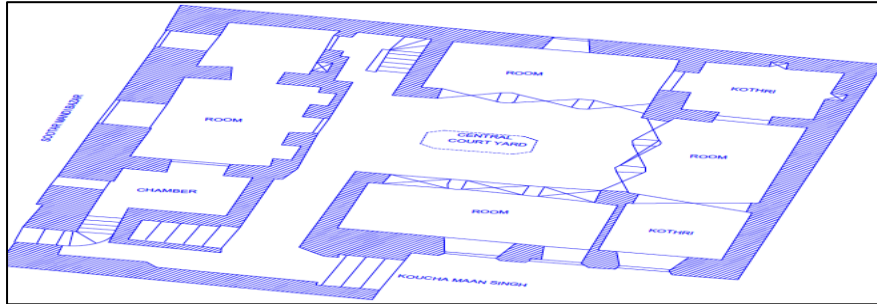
Plan of House No. D/749 (Source: Authors)
